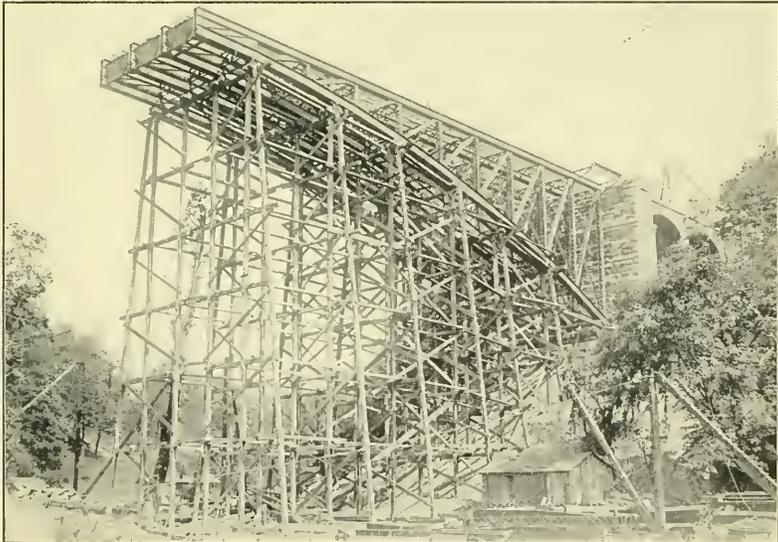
THE ERECTION OF A HALF SPAN OF THE PANTHER HOLLOW BRIDGE.
